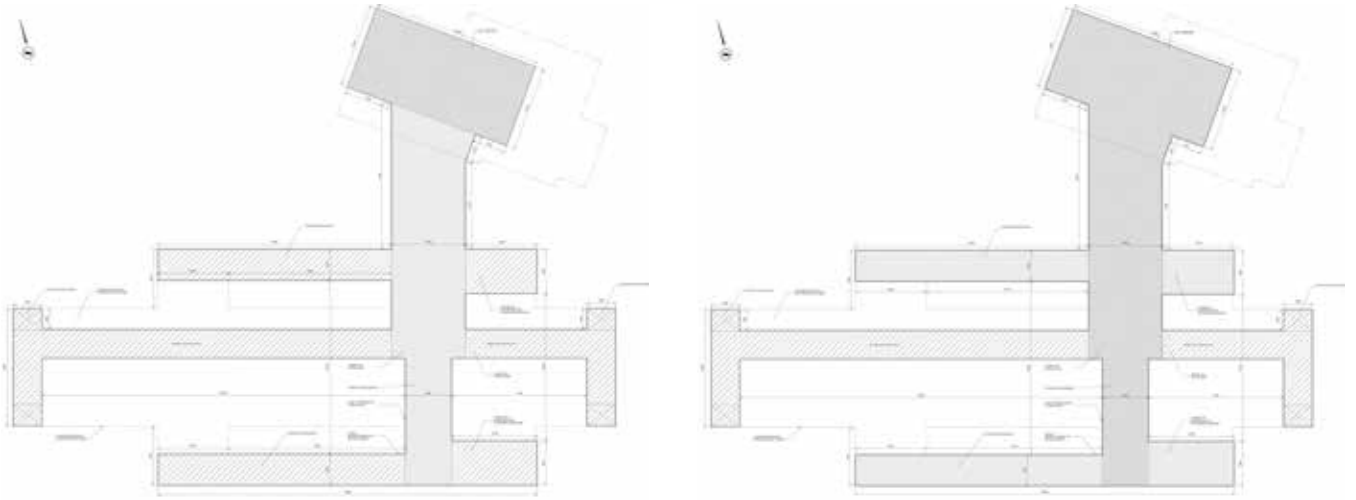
Schematic of excavation of auxiliary tunnels after shaft excavation
